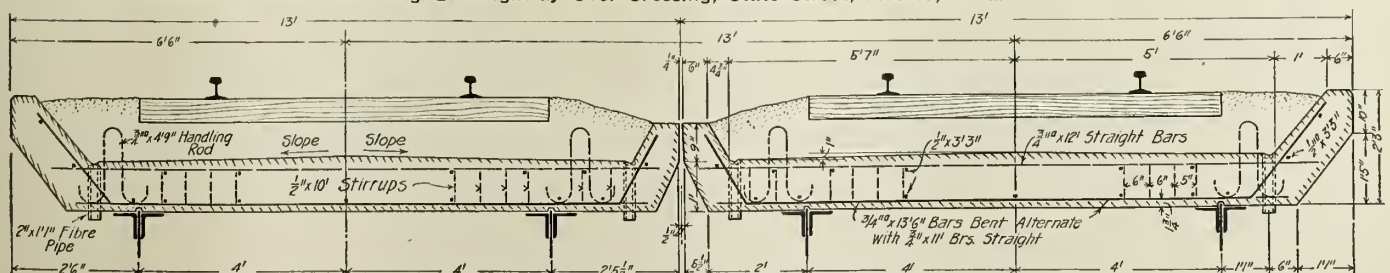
Standard Concrete Deck for Double Track on Plate Girders, C., M. & St. P. Ry.
